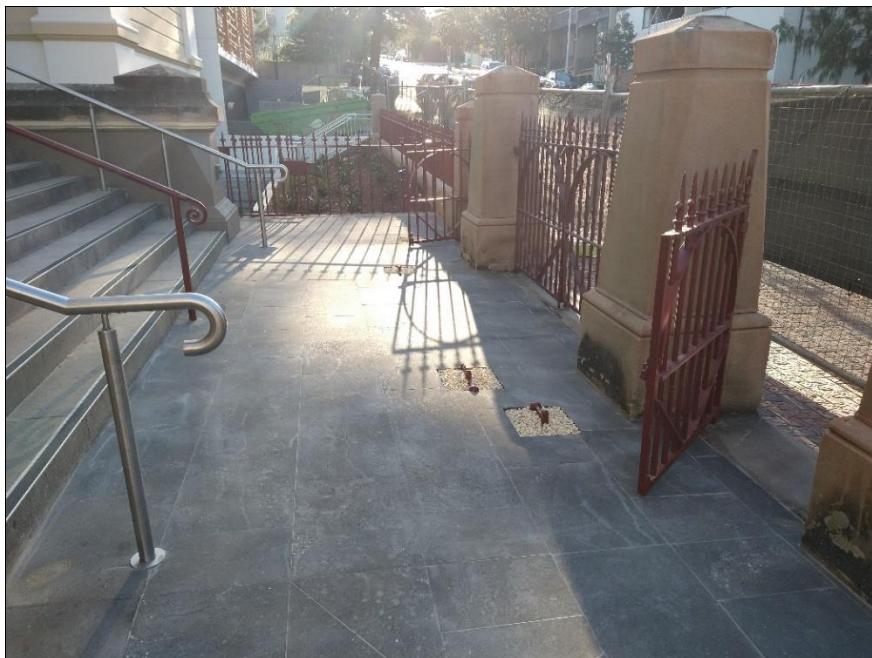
Looking west at Bluestone paving and adjacent garden bed along the northern side (front) of the central building (20 August 2021)
